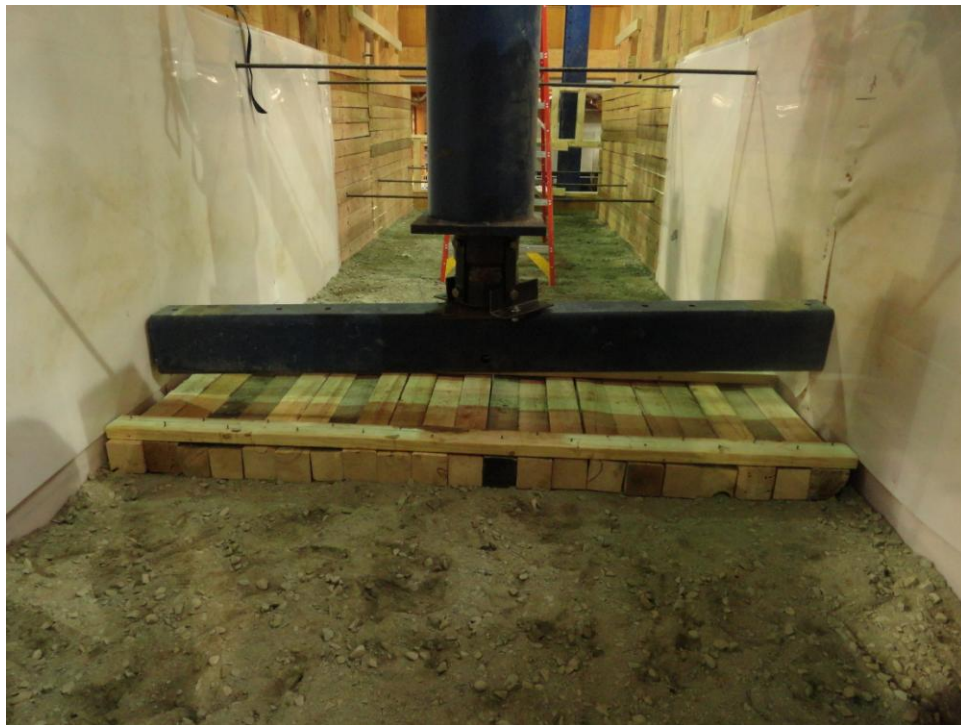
Photograph of Load Beam Before Ultimate Load Test of Short Bridge
